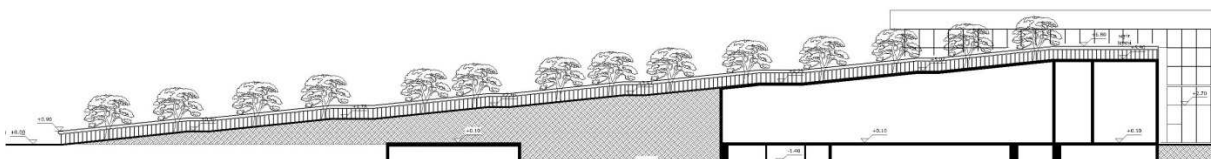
Section of the ramp to the observation deck on the top of conference hall
